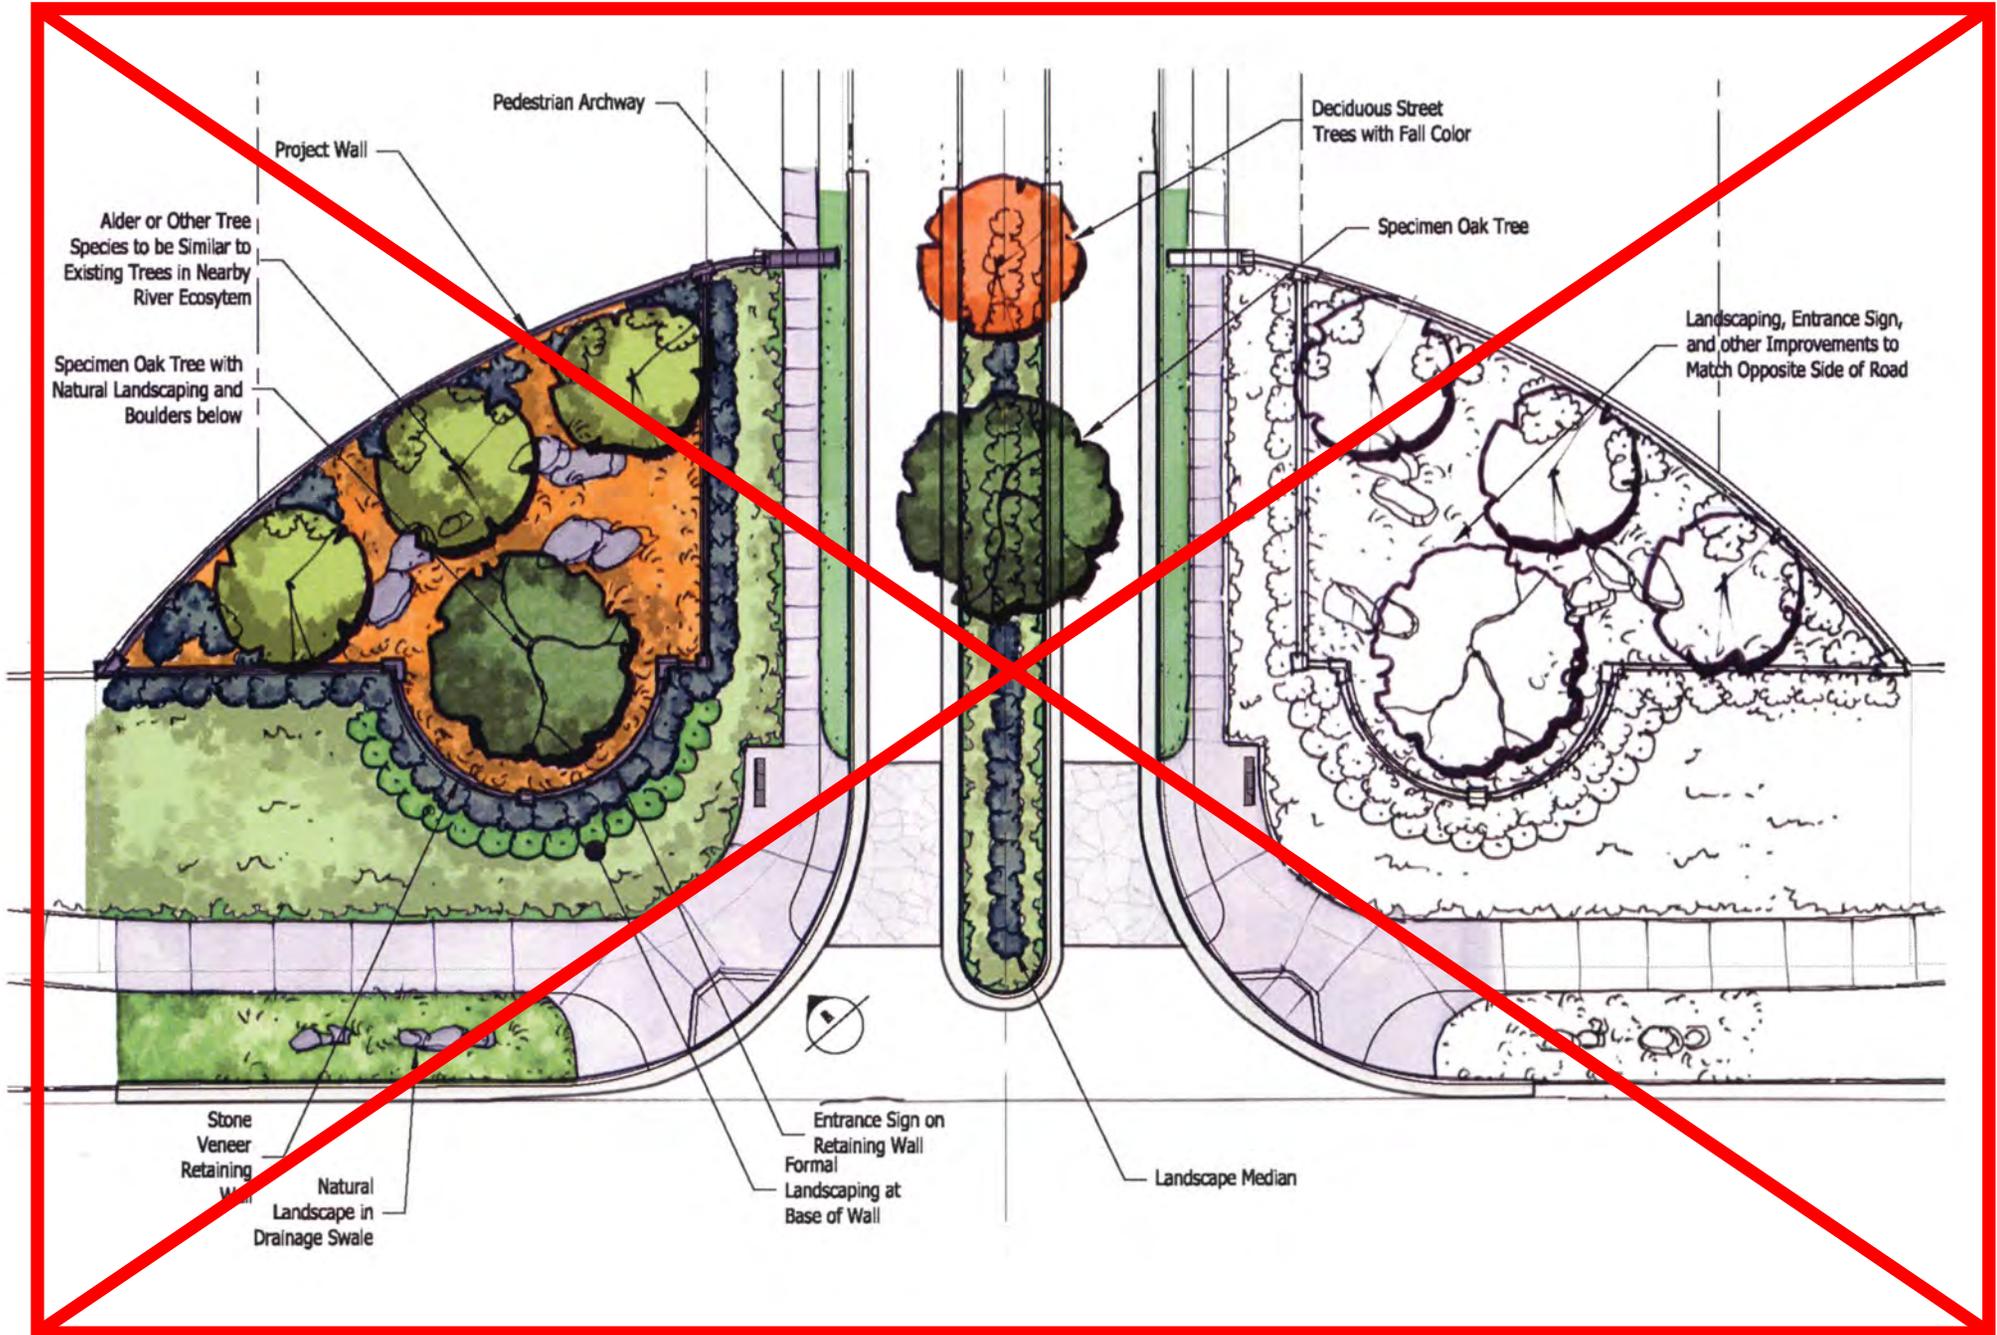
PFE EAST GATEWAY CONCEPT
